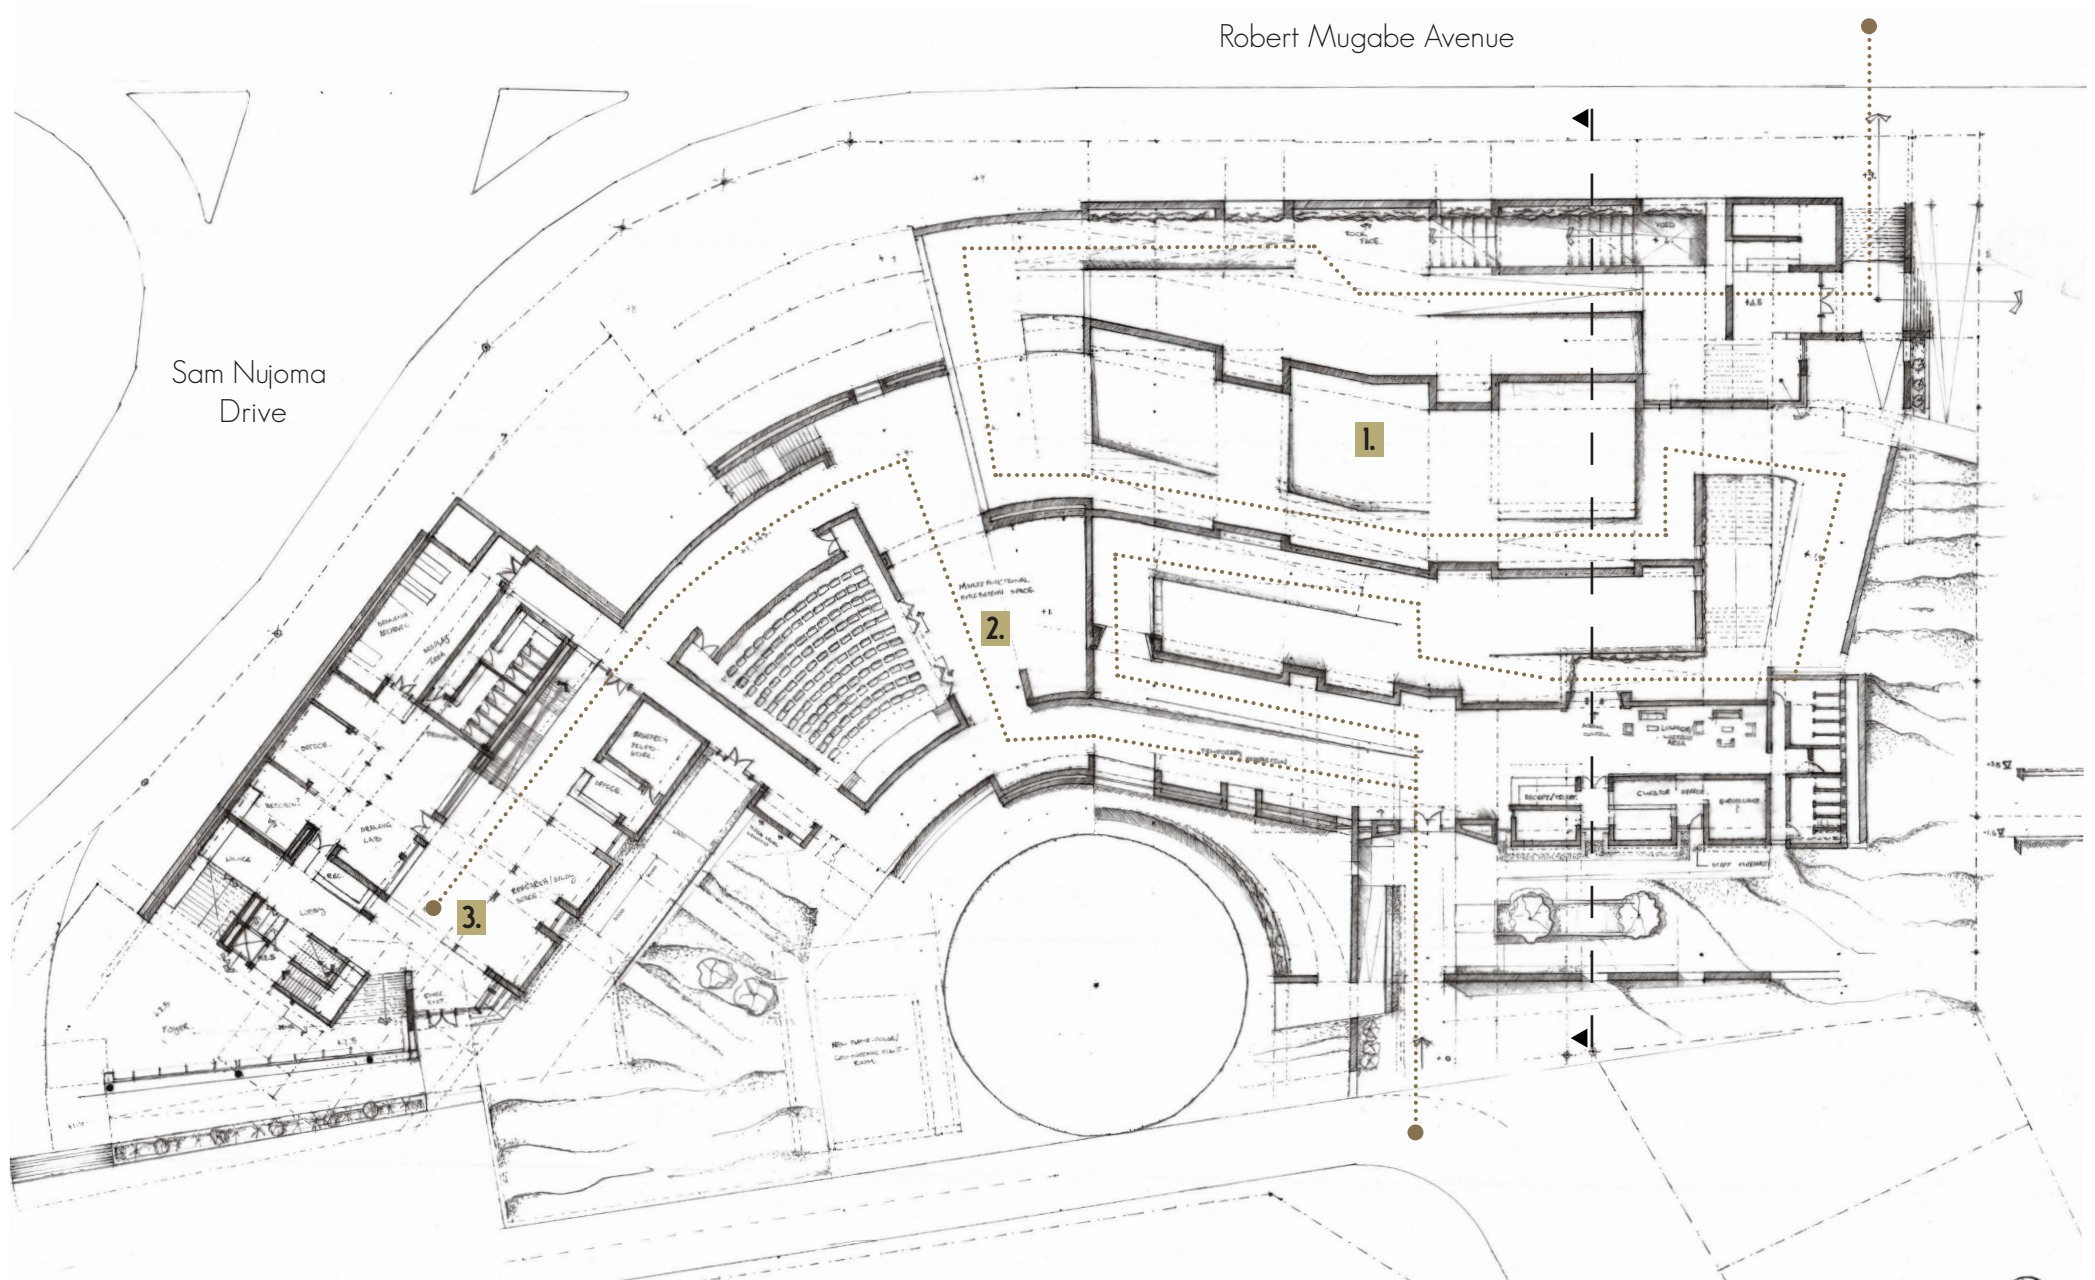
Roof Plan linking the site from Robert Mugabe Avenue to Garten Street. The building becomes a promenade linking historical buildings within its context.
